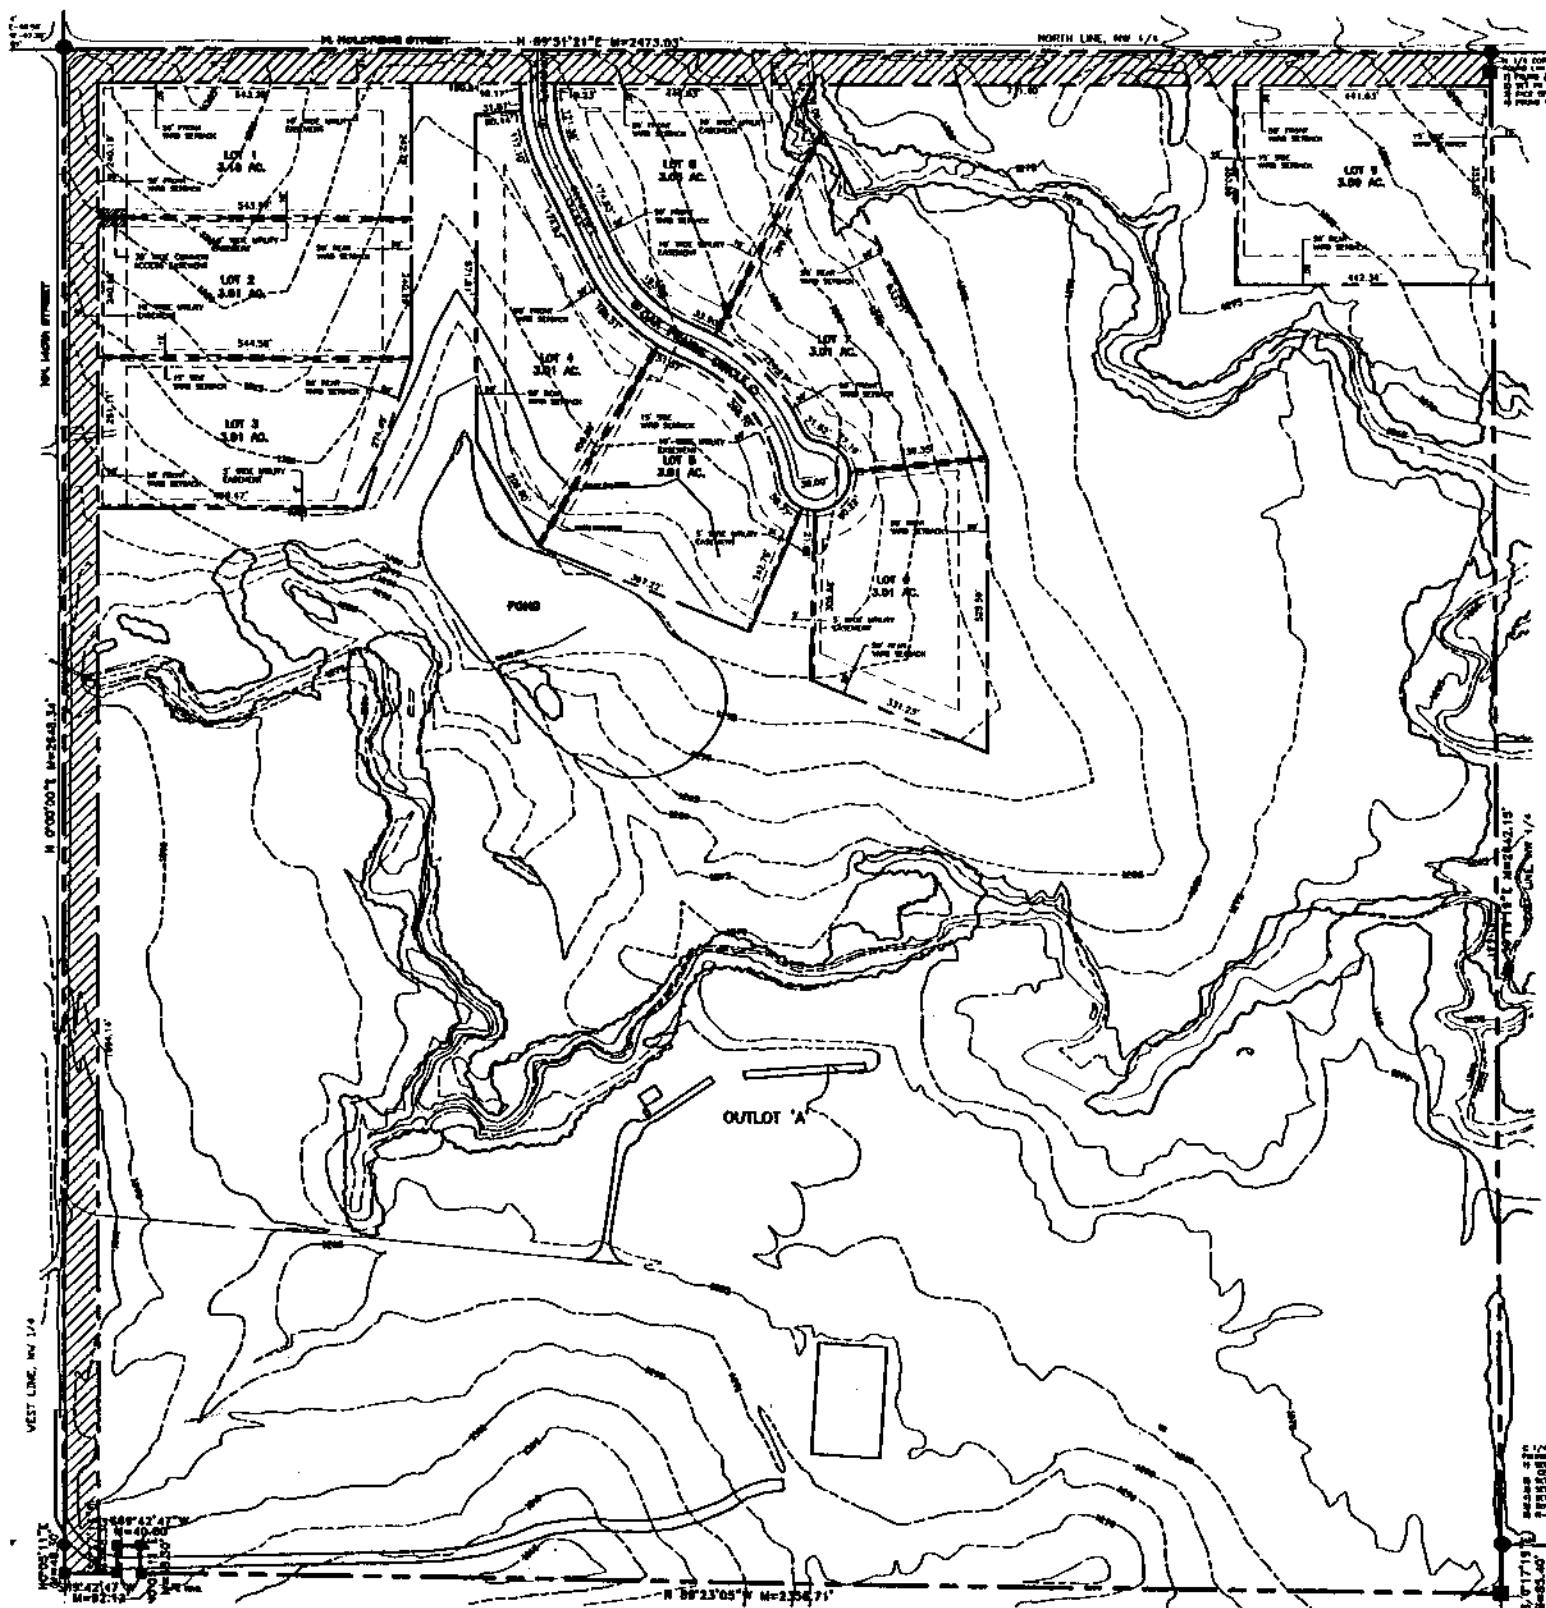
Oak Prairie, N.W. 140th and West Holdrege Street, Community Unit Site Plan.
